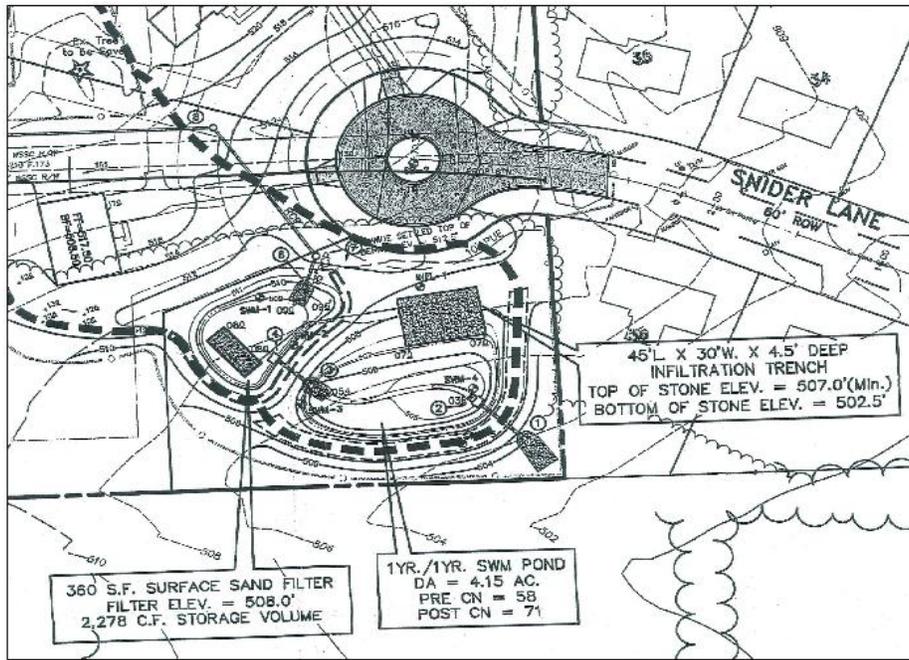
Snider's Estates stormwater management facility structure and drainage area detail (Jones & Schreiner 2008).
